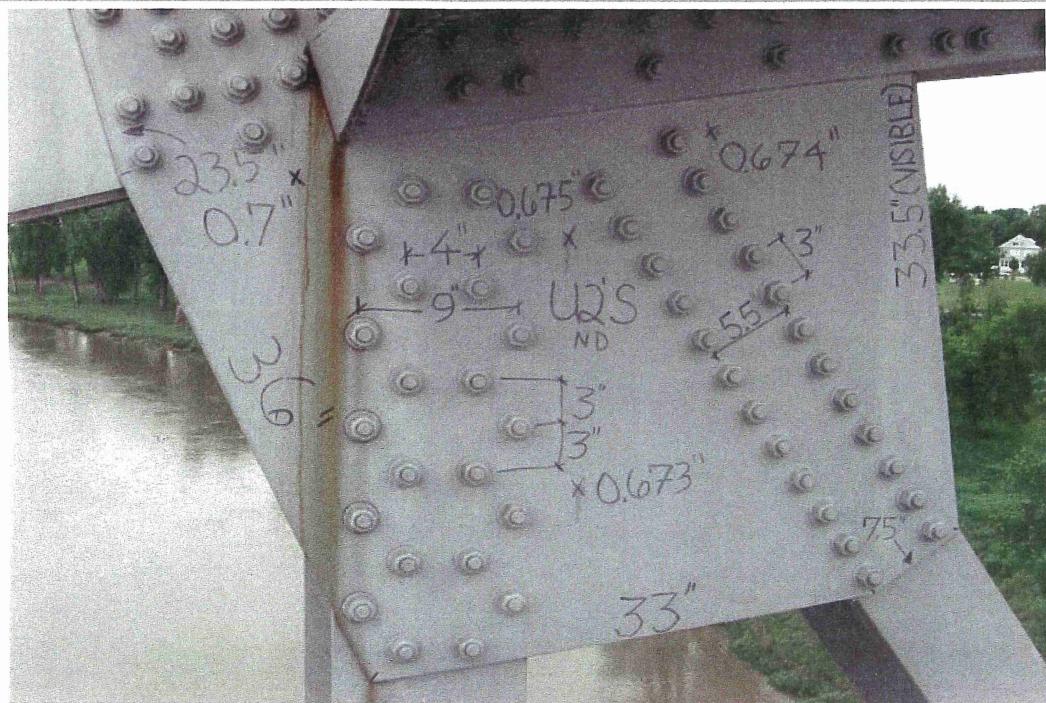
Panel Point U2'S, inner gusset plate. Looking south.
